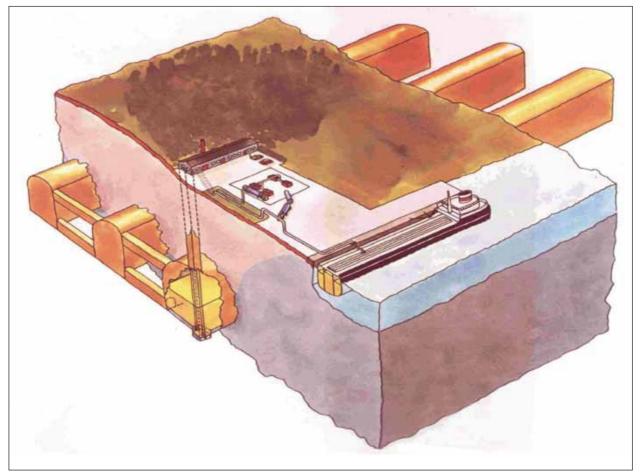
Typical underground storage facility with tanker unloading facilities and truck loading. (Illustration: Sentab / Skanska)
